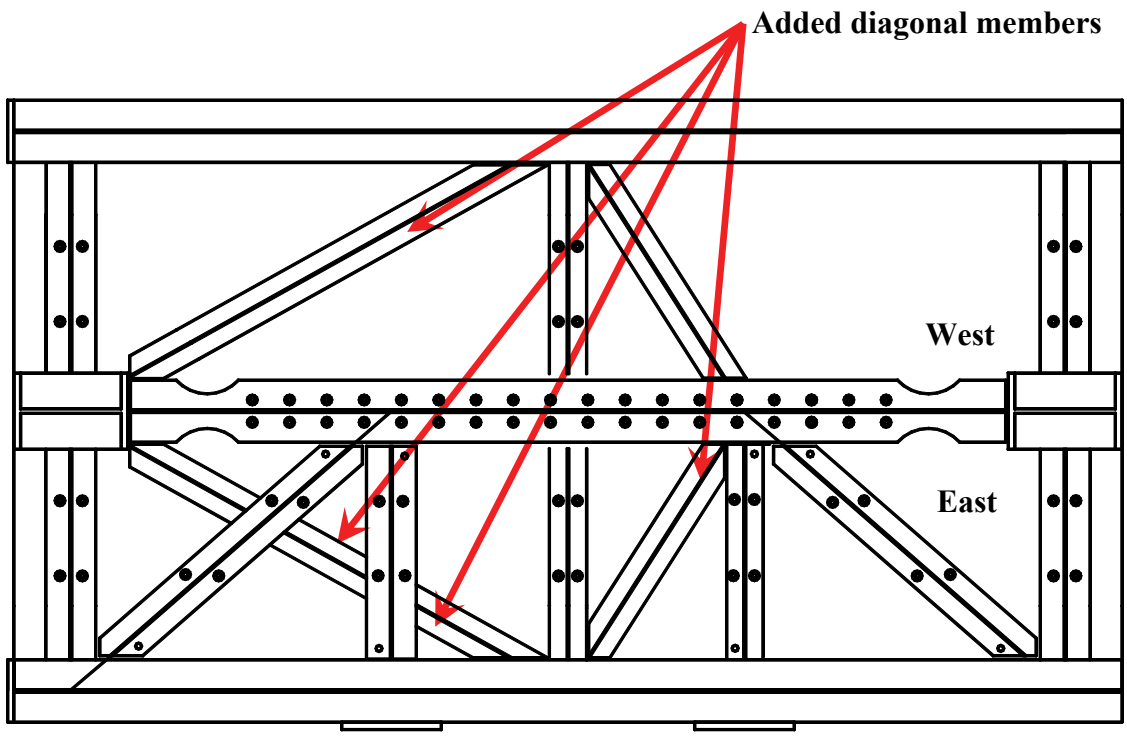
Layout of the Intermediate Floor Truss Strengthened after Test 1
